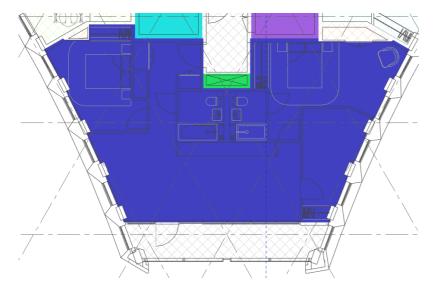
3 Bed Appartment on 27th Floor
